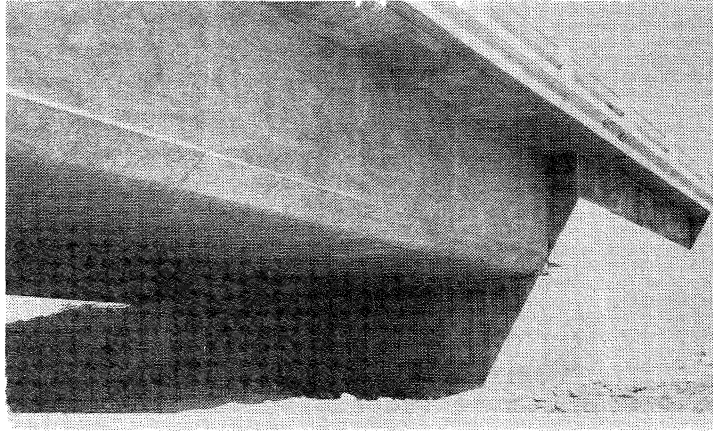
Abutment of the remaining eastern section of the South Connector Overcrossing. Spalling occurred at the monolithic joint between superstructure and abutment but there was no evidence of appreciable displacement.
